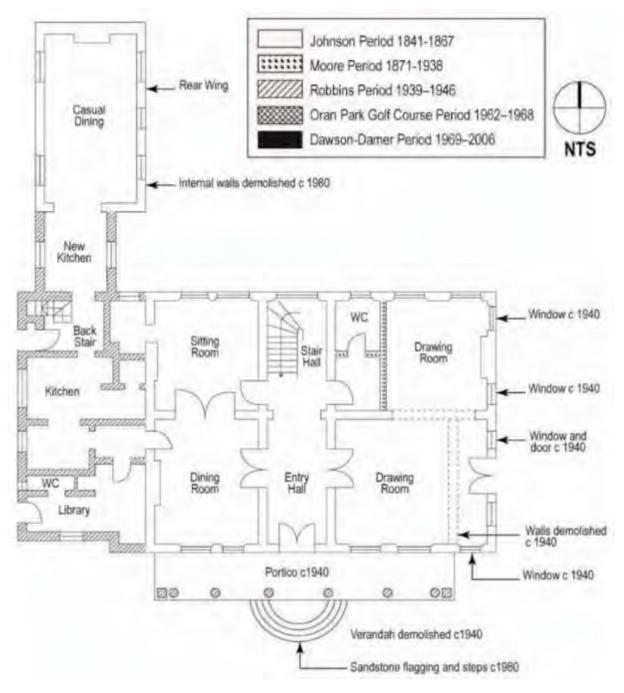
Ground Floor Sketch Plan not to scale. Source: GML 2010 CMP pg. 58.
